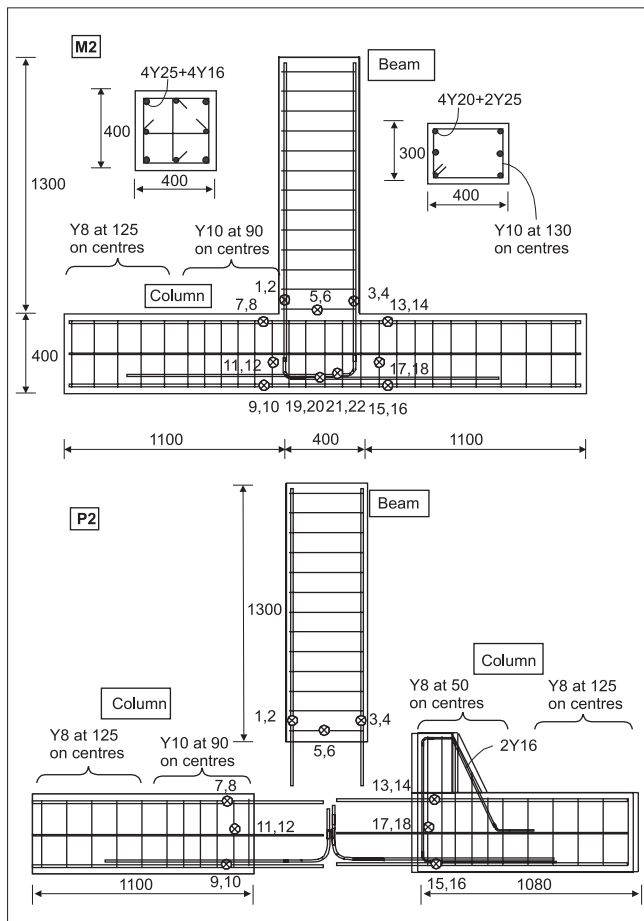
Details of geometry and reinforcement of the specimens M2 and P2. Clear cover to beam and column reinforcements are 25 mm and 40 mm, respectively. ⊙ denotes location of strain gauge
